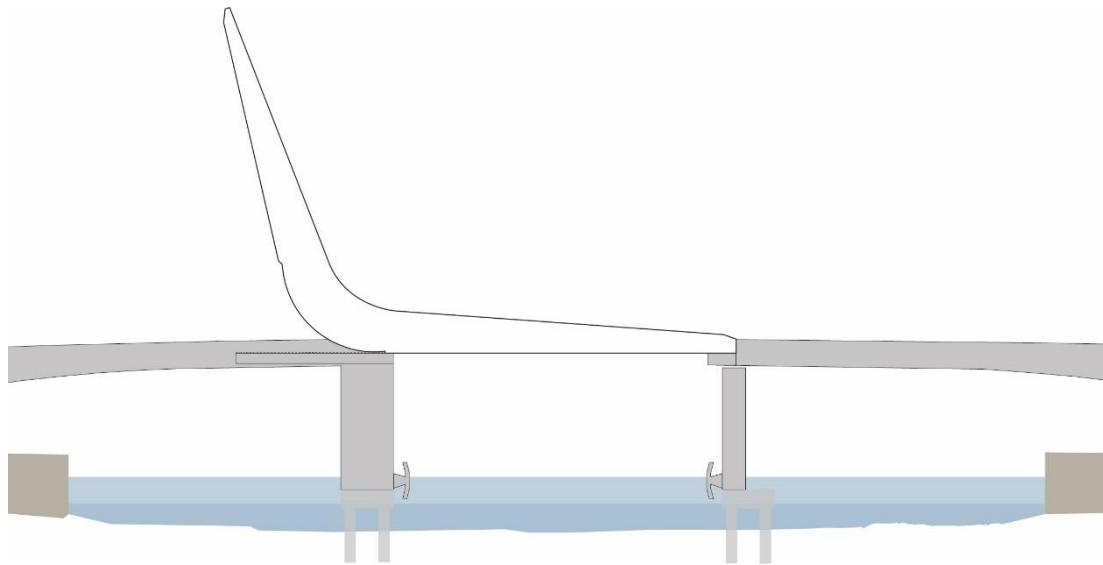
Elevation view of the rolling lift bascule bridge in lowered position
